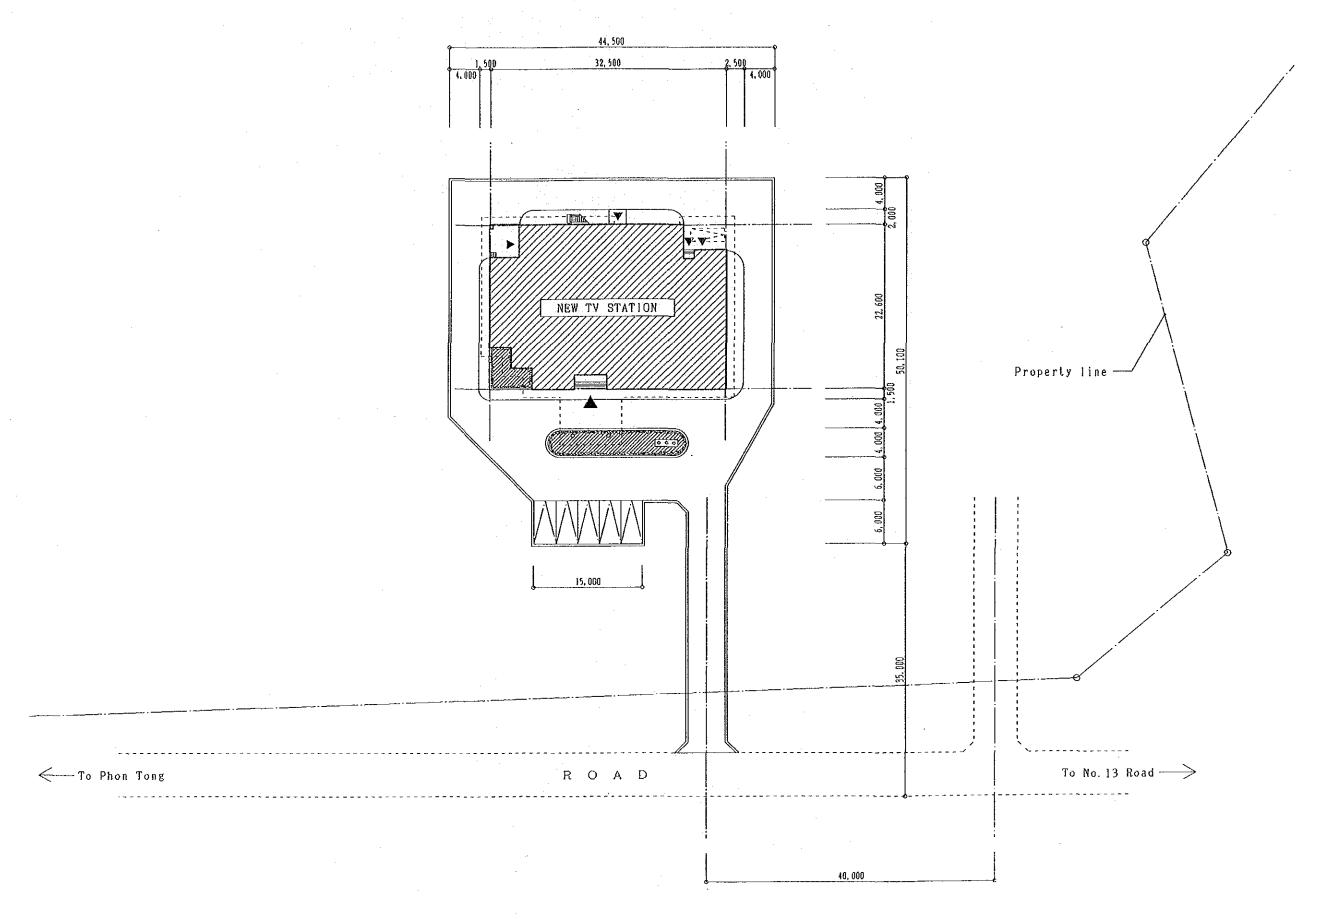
SITE LAYOUT PLAN, SCALE 1:500
